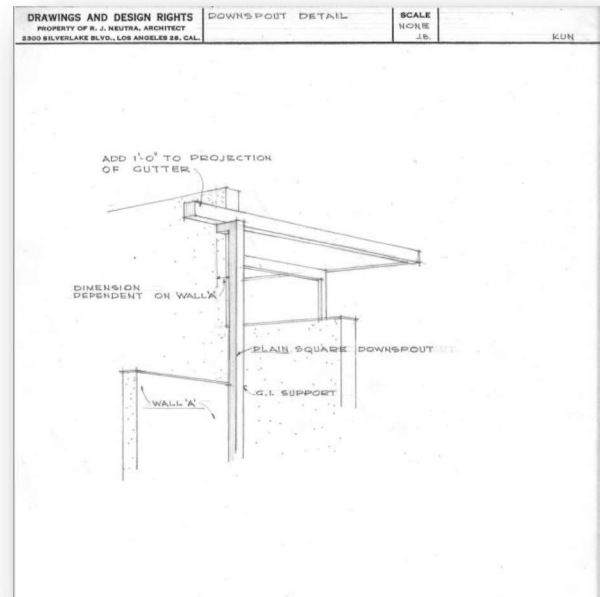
1949 detail of corrugated metal gutter on Kun House II's south elevation, facing Fareholm Drive (Source: UCLA Special Collections)
